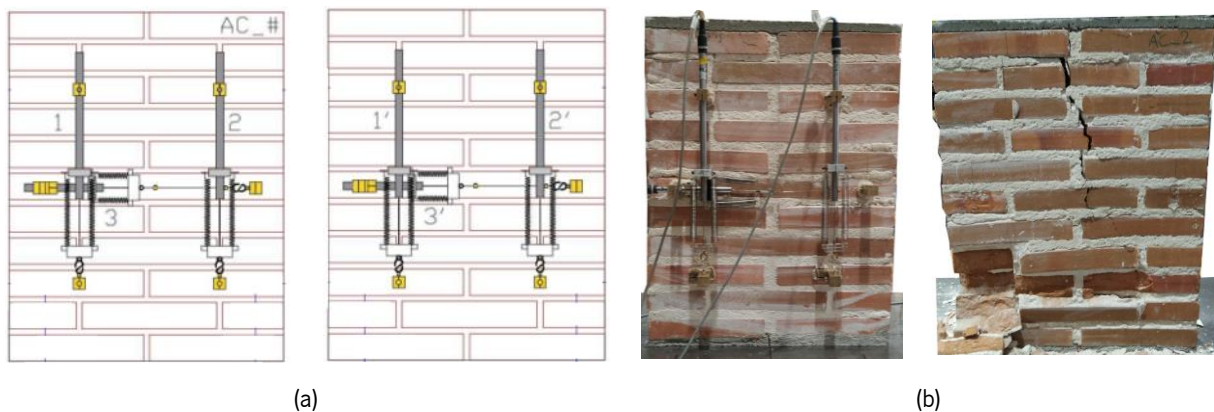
Axial compression tests: (a) setup of wallets (front and back face), (b) undamaged and damaged AC₂.
